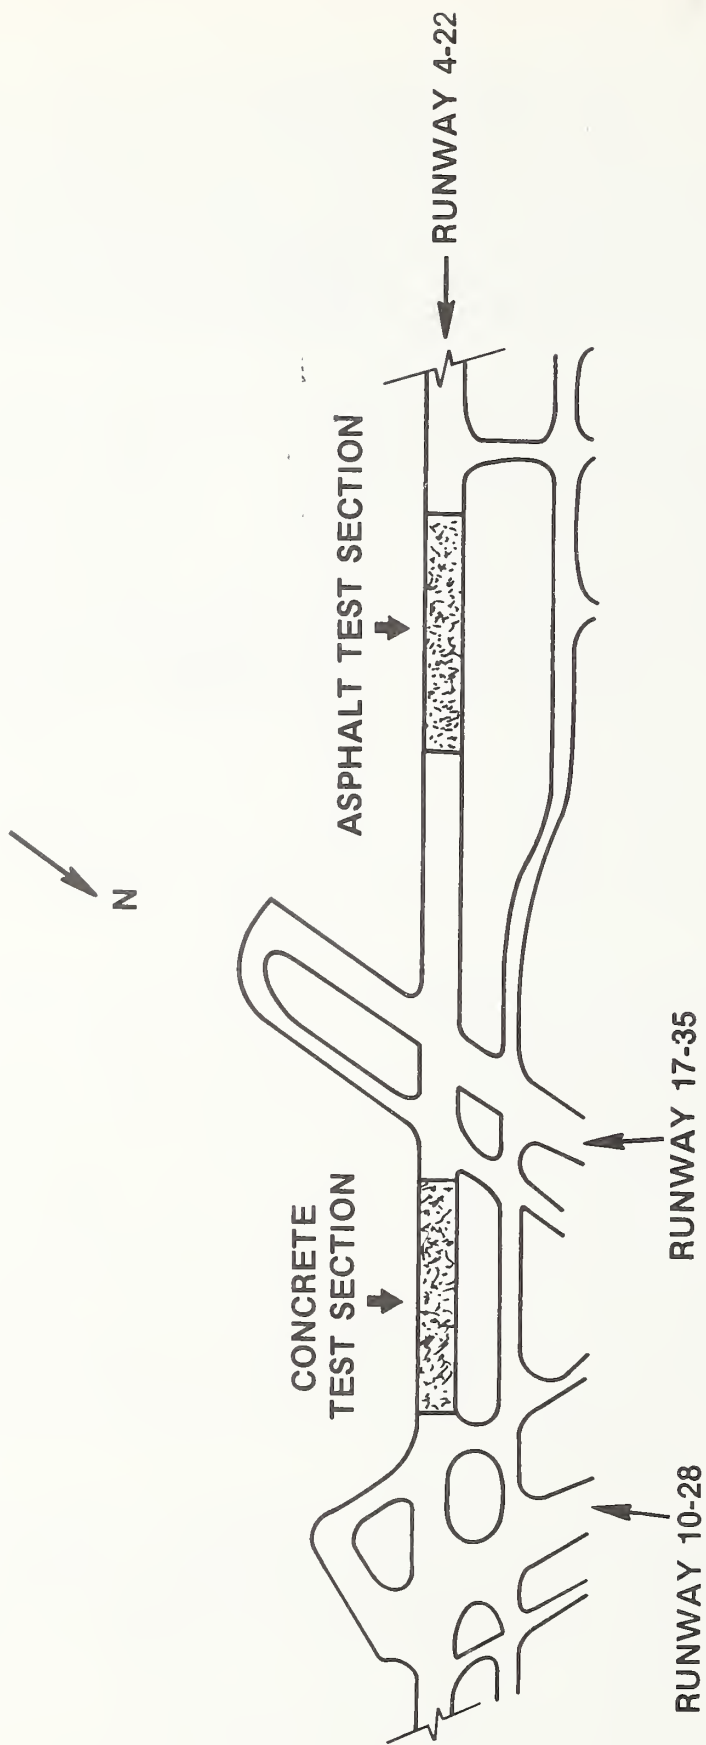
Plan of research runway 4-22 Wallops Station, Virginia, showing the locations of the concrete and asphalt test sections.
